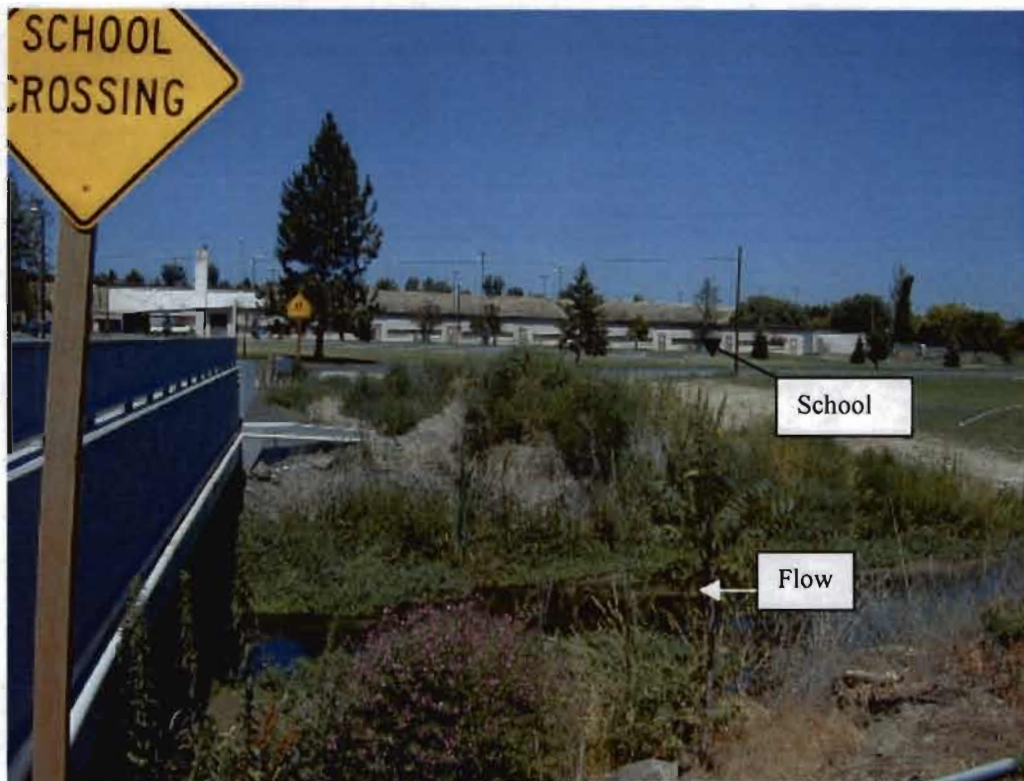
View looks north from Sherman St. bridge at elementary school.
